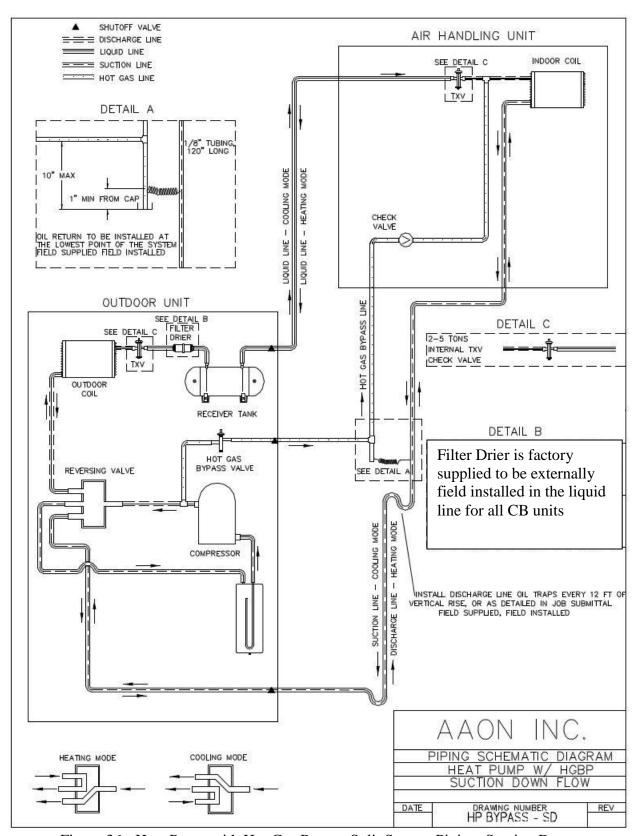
Heat Pump with Hot Gas Bypass Split System Piping, Suction Down
